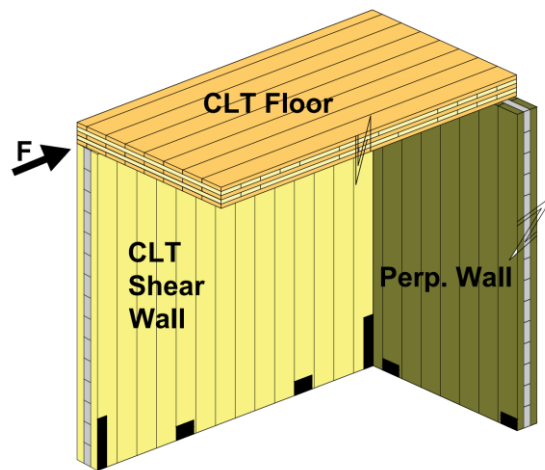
Influence of perpendicular wall and floor on CLT shear wall's deflection
